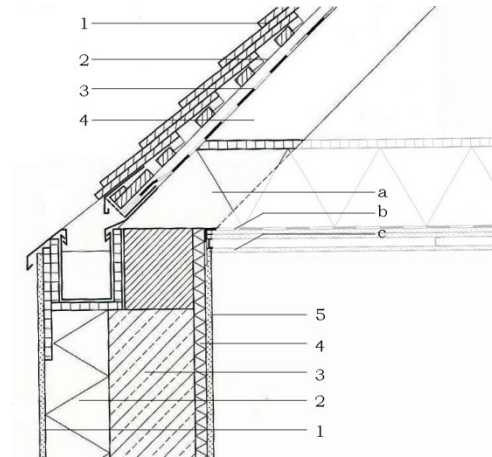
Analyzed exterior wall-roof coupling detail “Parish Hall, Hailfingen, Germany” (Detail, 2011, 10, p.1188)
